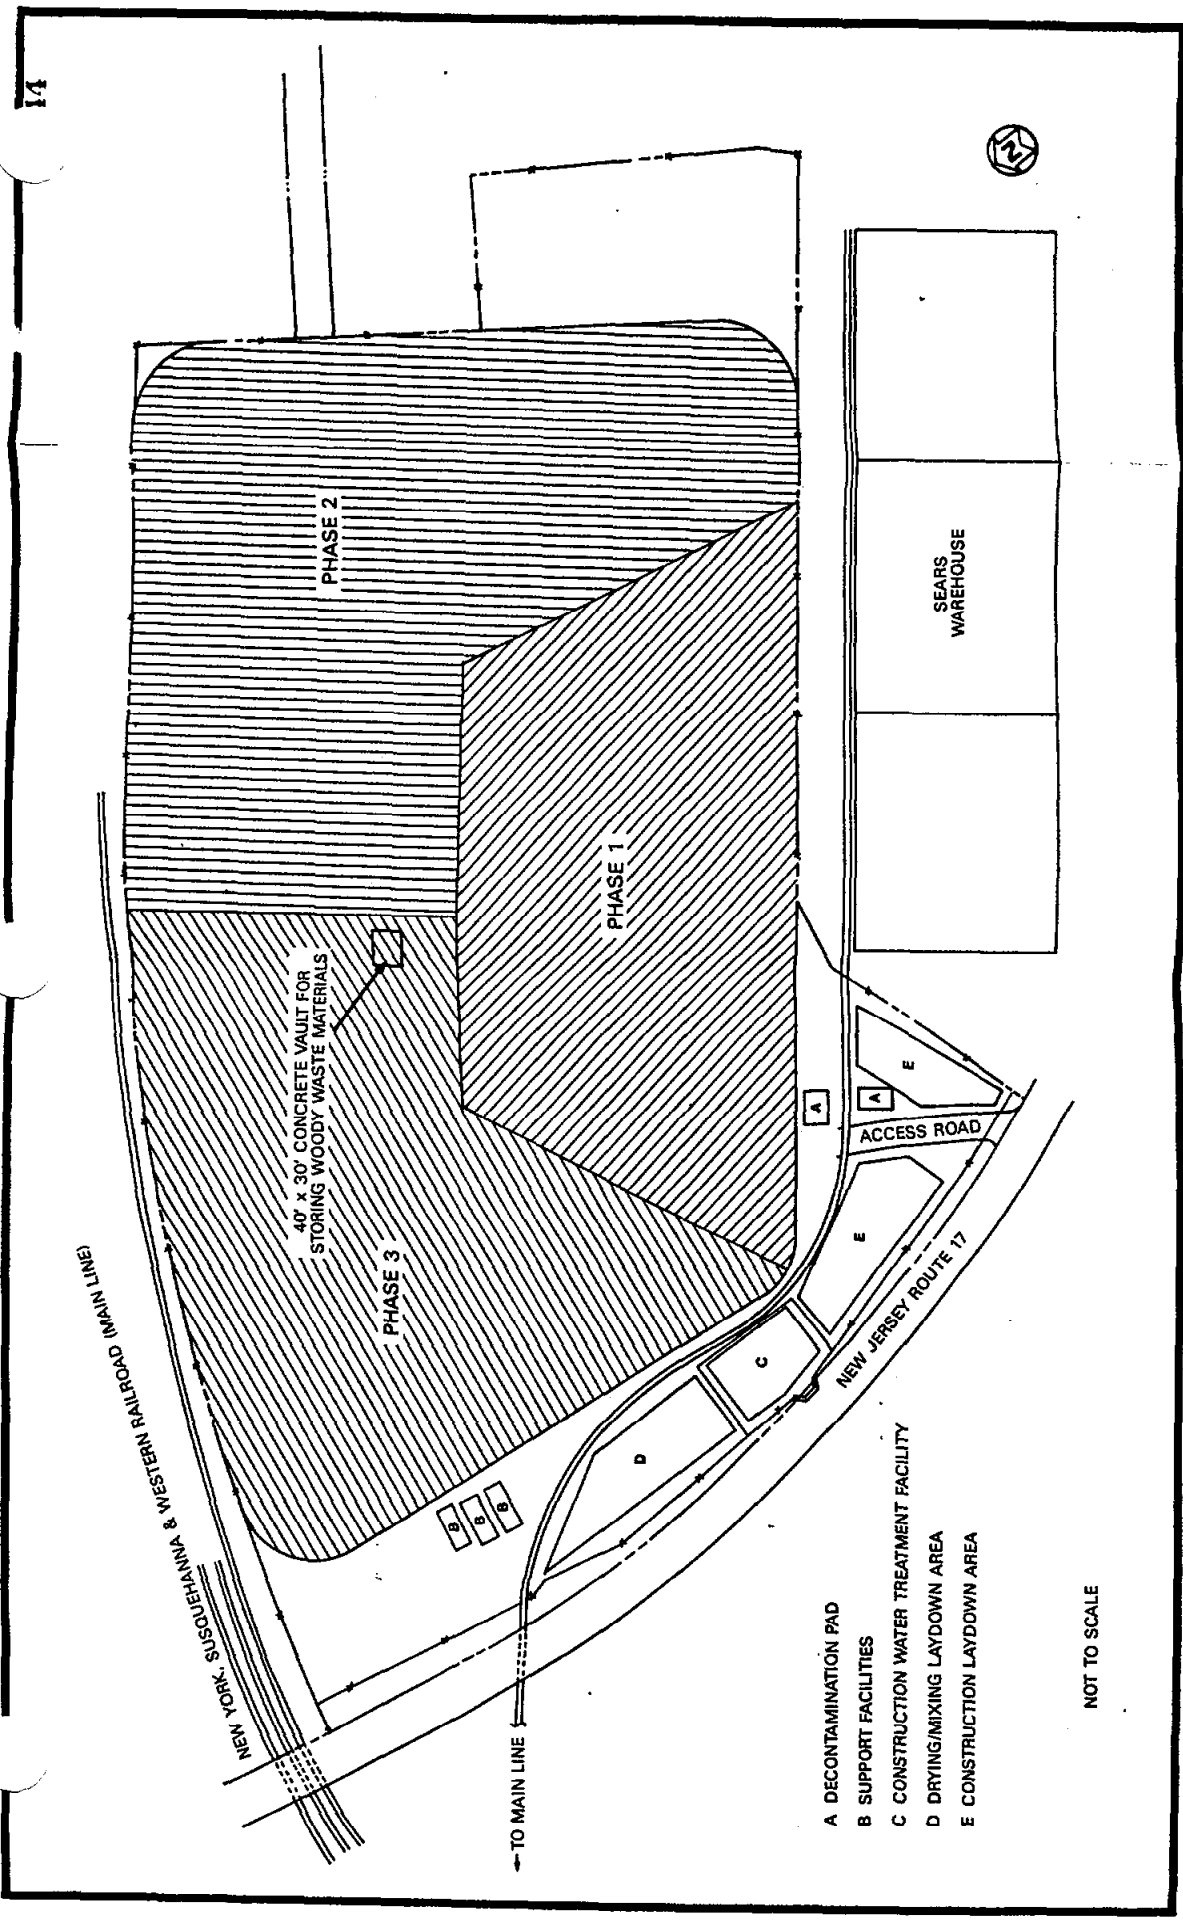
MAYWOOD DISPOSAL SITE CONSTRUCTION PHASES (ALTERNATIVE 2)
